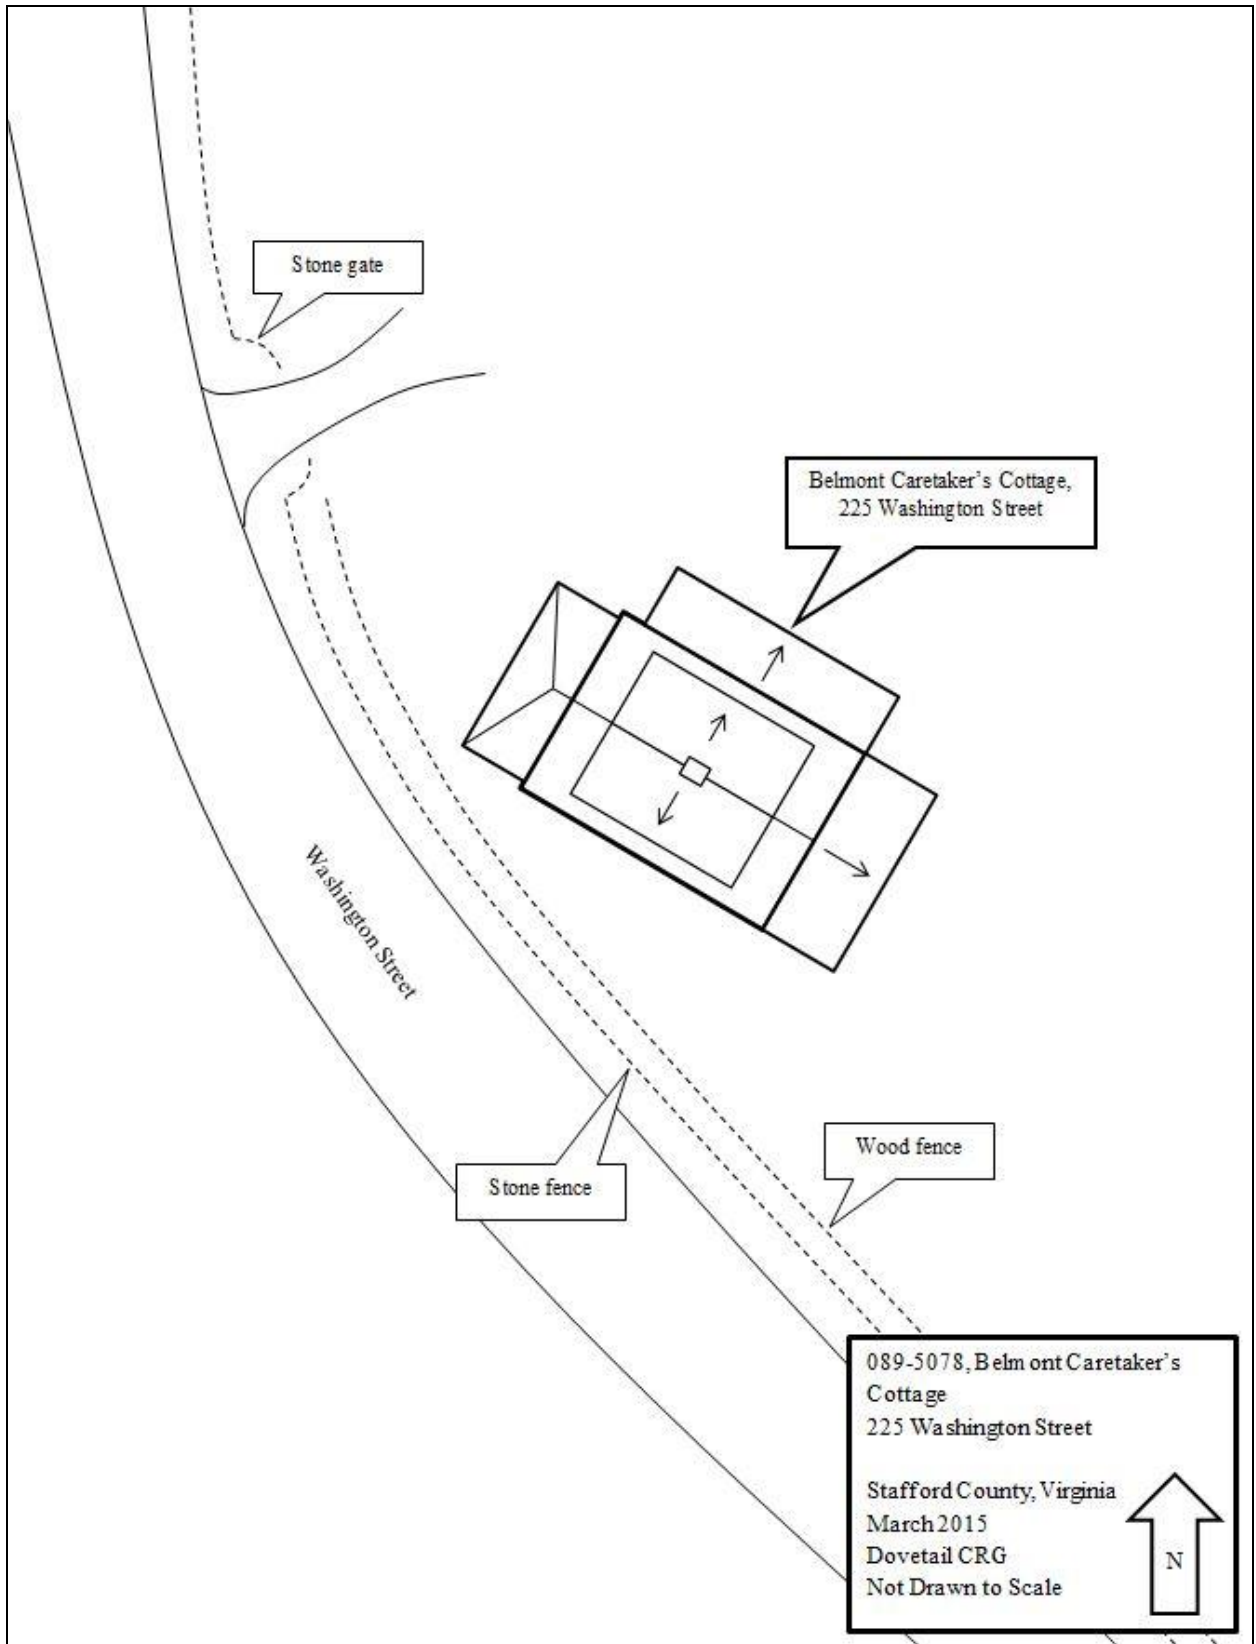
Site Plan of the Belmont Caretaker's Cottage.
